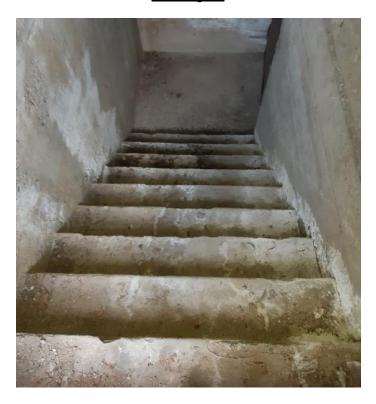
Basement, floor near entrance, 4 square metres debris on stairs.
